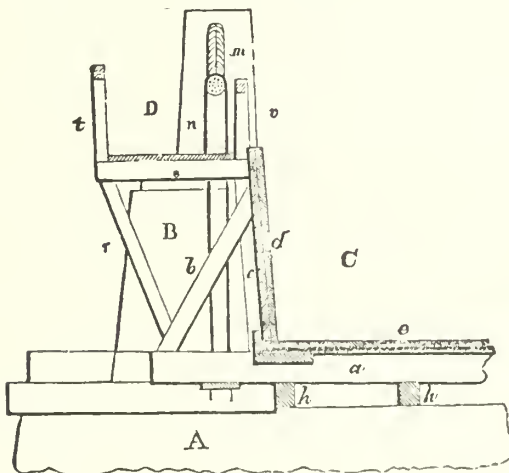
shows in elevation a portion of the stone supports, and a cross section of the trunk, &c., of the Allegheny canal aqueduct-bridge.
